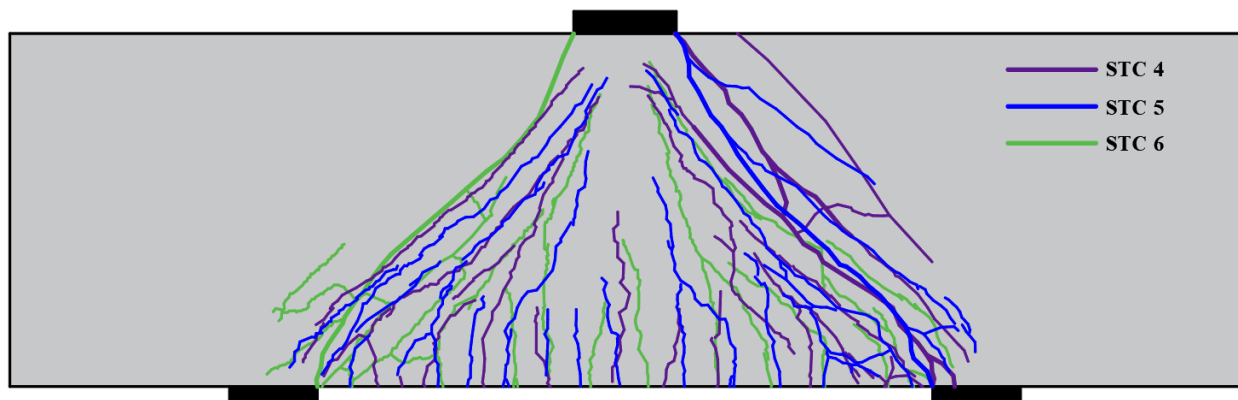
Overlapping crack patterns of beams STC4, STC5, and STC6.
